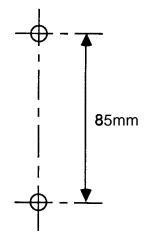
WALL MOUNTING DIMENSIONS FOR DOOR STATIONS
